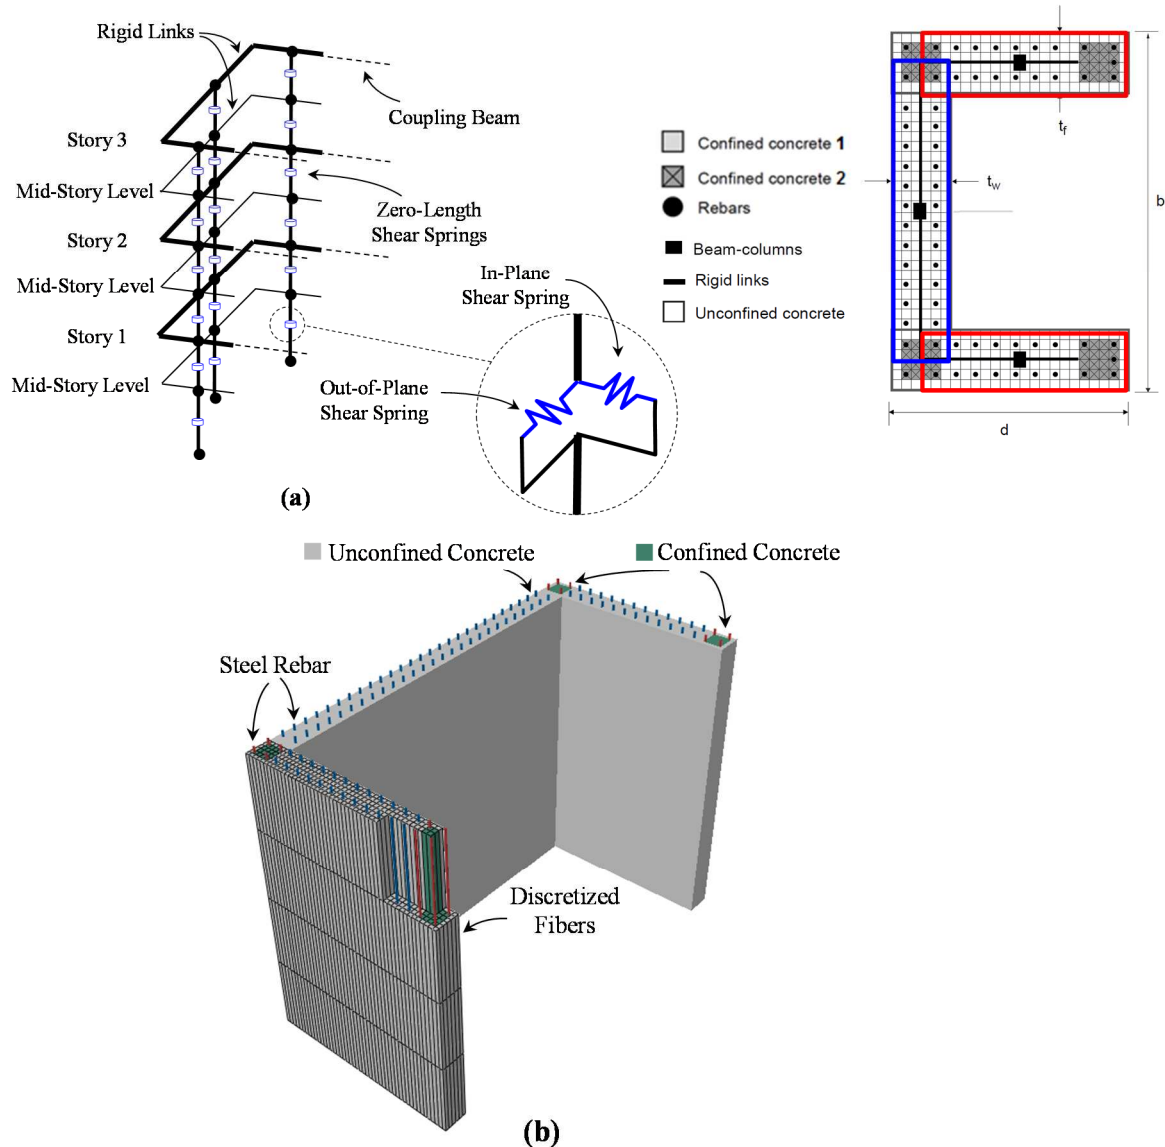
Wide Column Model for the C-shaped core wall, a) isometric view of an RC core elements and position of the wall elements and links, b) subdivision of the fibre cross-section of C-shaped RC core
